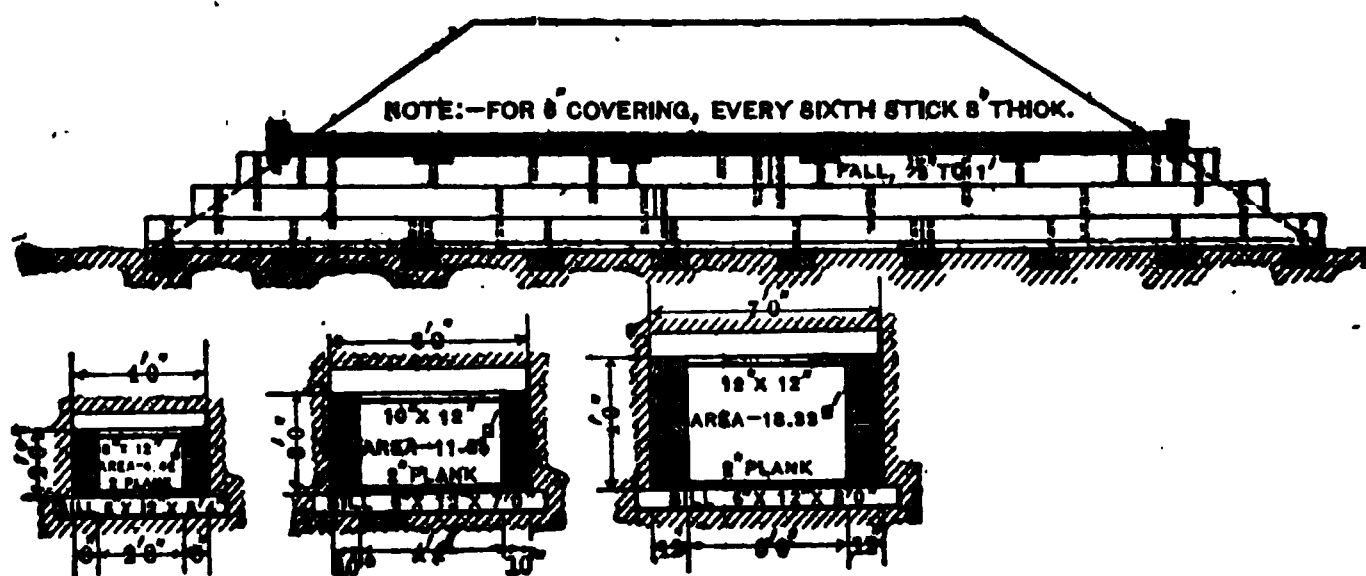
STANDARD TIMBER BOX CULVERT. C., M. & St. P. Ry. (Feb. 1889.)
